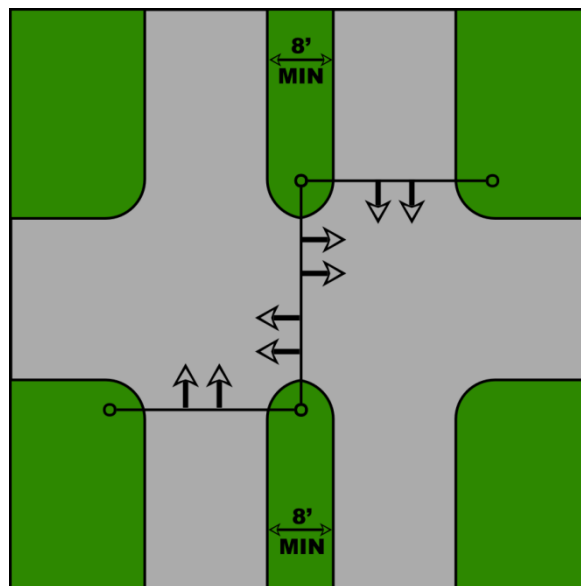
Span Wire Arrangement: Z Span with Curbed Median
